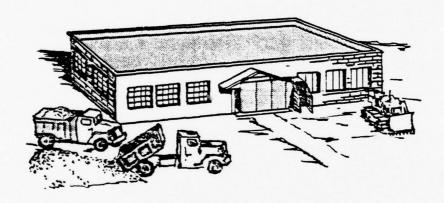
ILLUSTRATION OF BOARDED OPENINGS.
